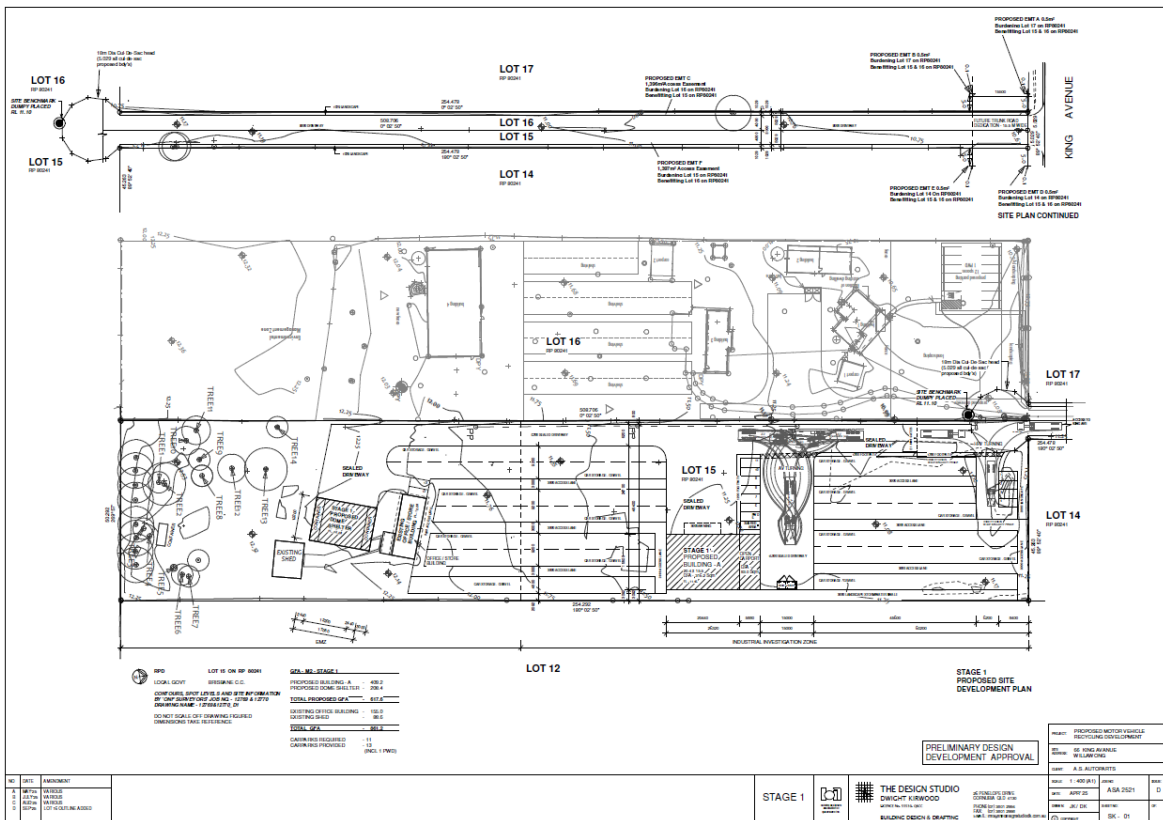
Proposed Site Plan – The Design Studio (September 2025)
